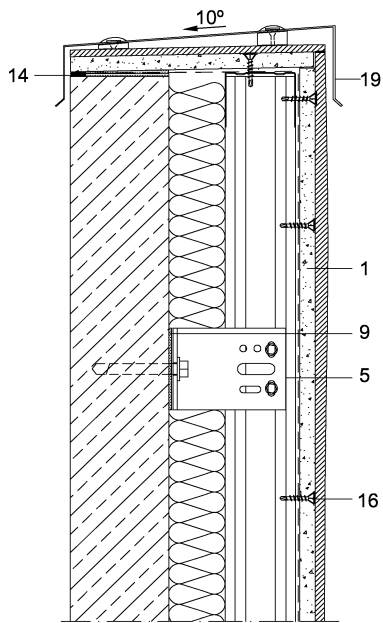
Roof edge (non-ventilated cladding system).
